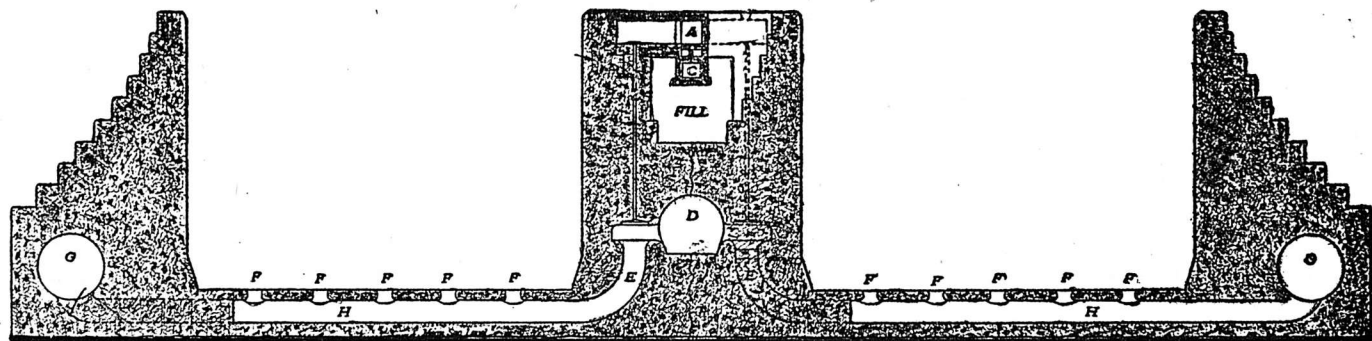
PLATE D—CROSS SECTION OF LOCK CHAMBERS AND WALLS OF LOCKS
